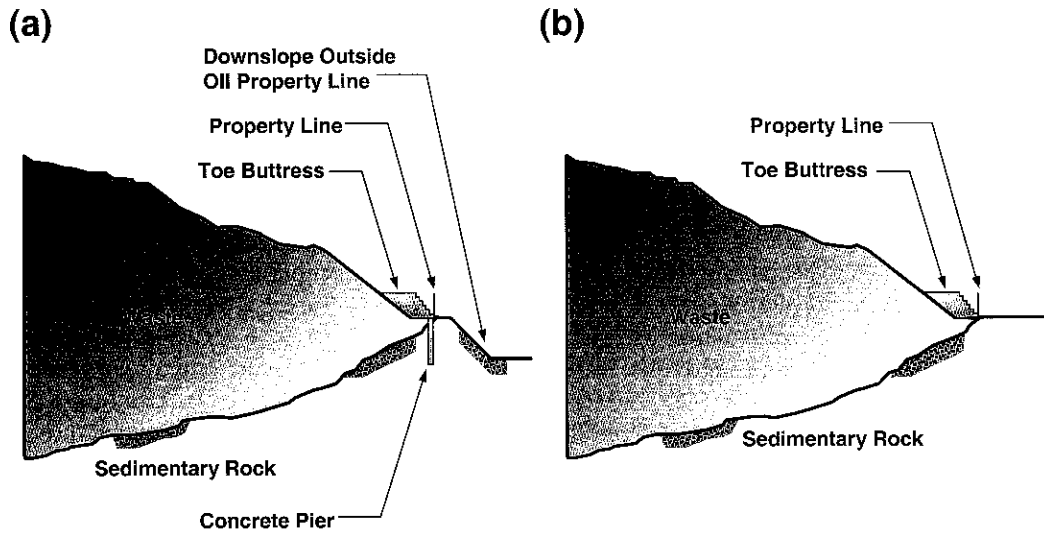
Typical profiles of the toe buttress at the OII Superfund Landfill: (a) profile with concrete piers, (b) profile without concrete piers
